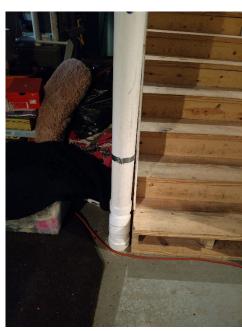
Extraction point vertical sealed with polyurethane sealant.
